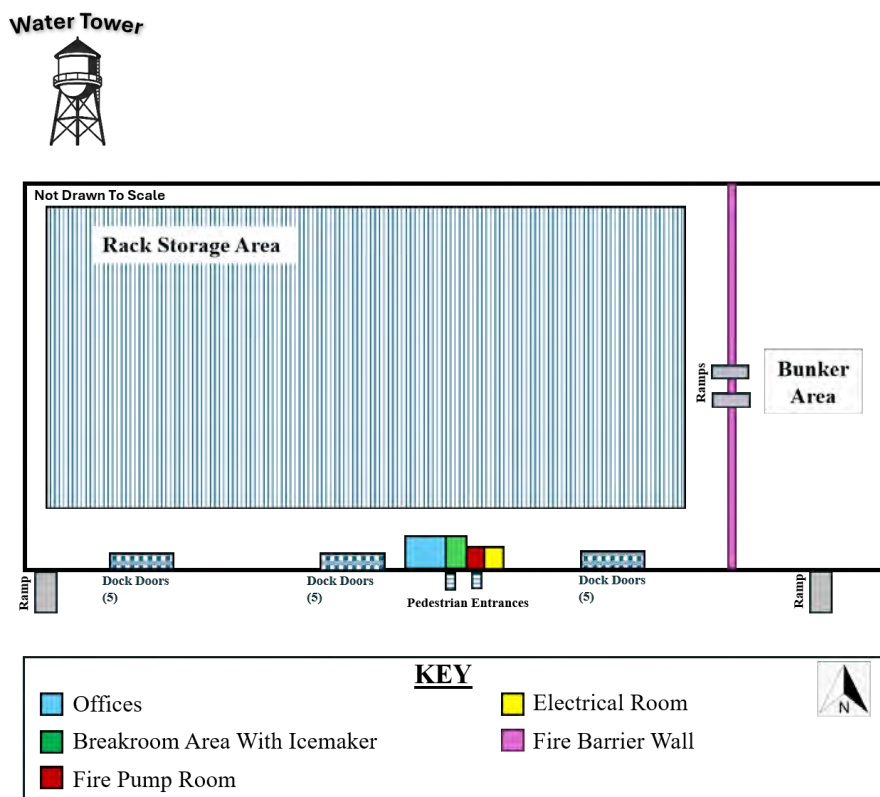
The Bio-Lab Conyers Plant 12 Storage Warehouse floor plan. (Credit: CSB)
